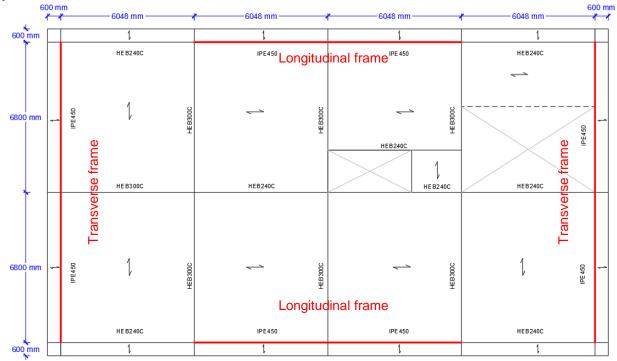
Plan view of floor 1 for the identification of Moment Resisting Frames (MRFs)
